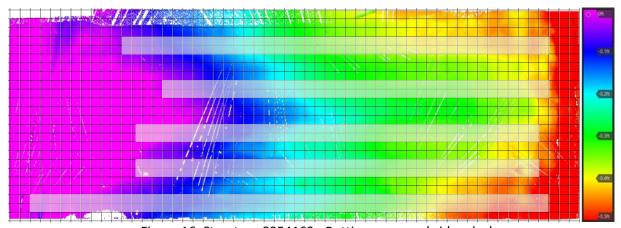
Structure 0954163 - Rutting areas on bridge deck.
